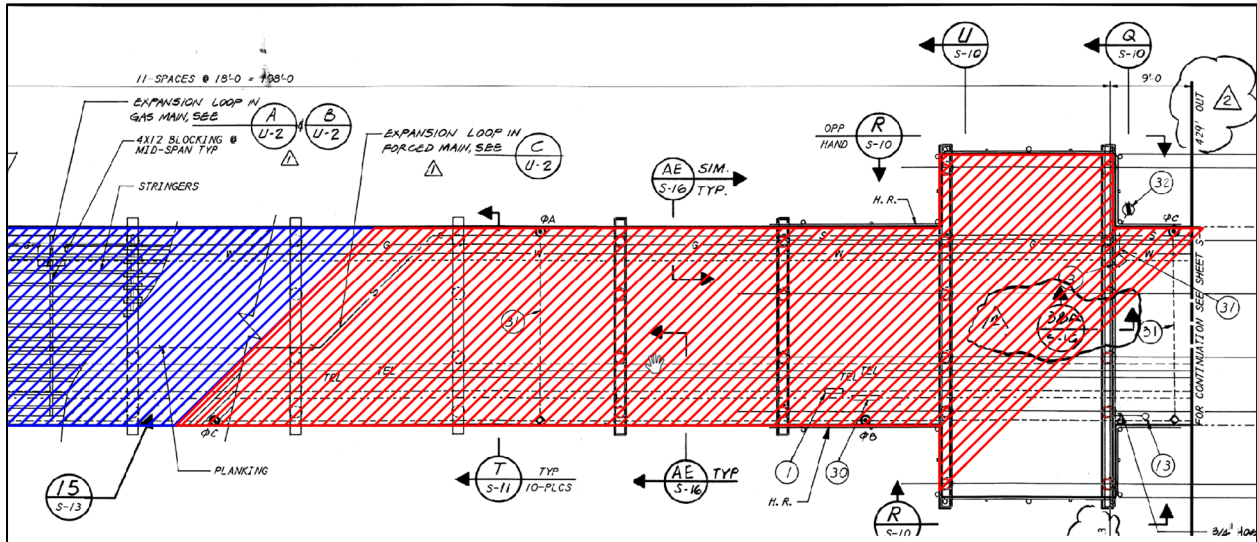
Pier Head Deck Board Replacement and Railing Repair Area. Decking in the blue outline area was replaced previously. The red area is the proposed area to be replaced in this phase.
